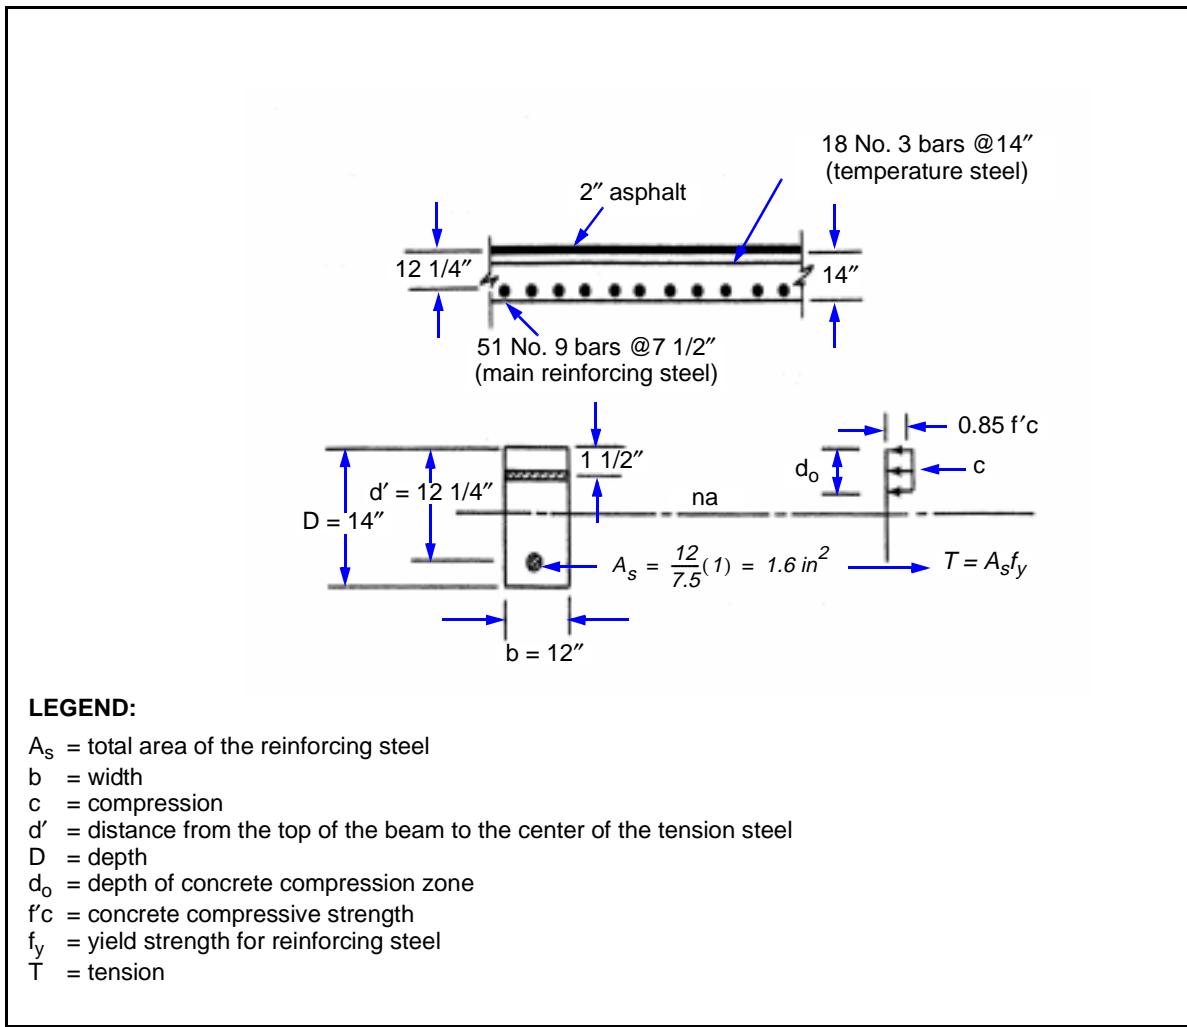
Steel-Reinforcement Details for a Concrete-Slab Bridge
